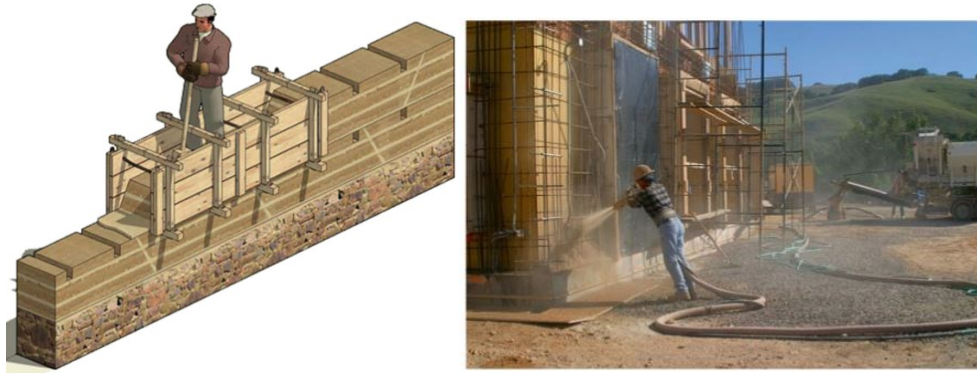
Rammed earth (at left)(*Betonarme: Bir Asrı Aşan Evliliğin Hikayesi*, 2023) and PISE technique including spraying the rammed earth onto one-sided formwork (at right) (Minke, 2009).
